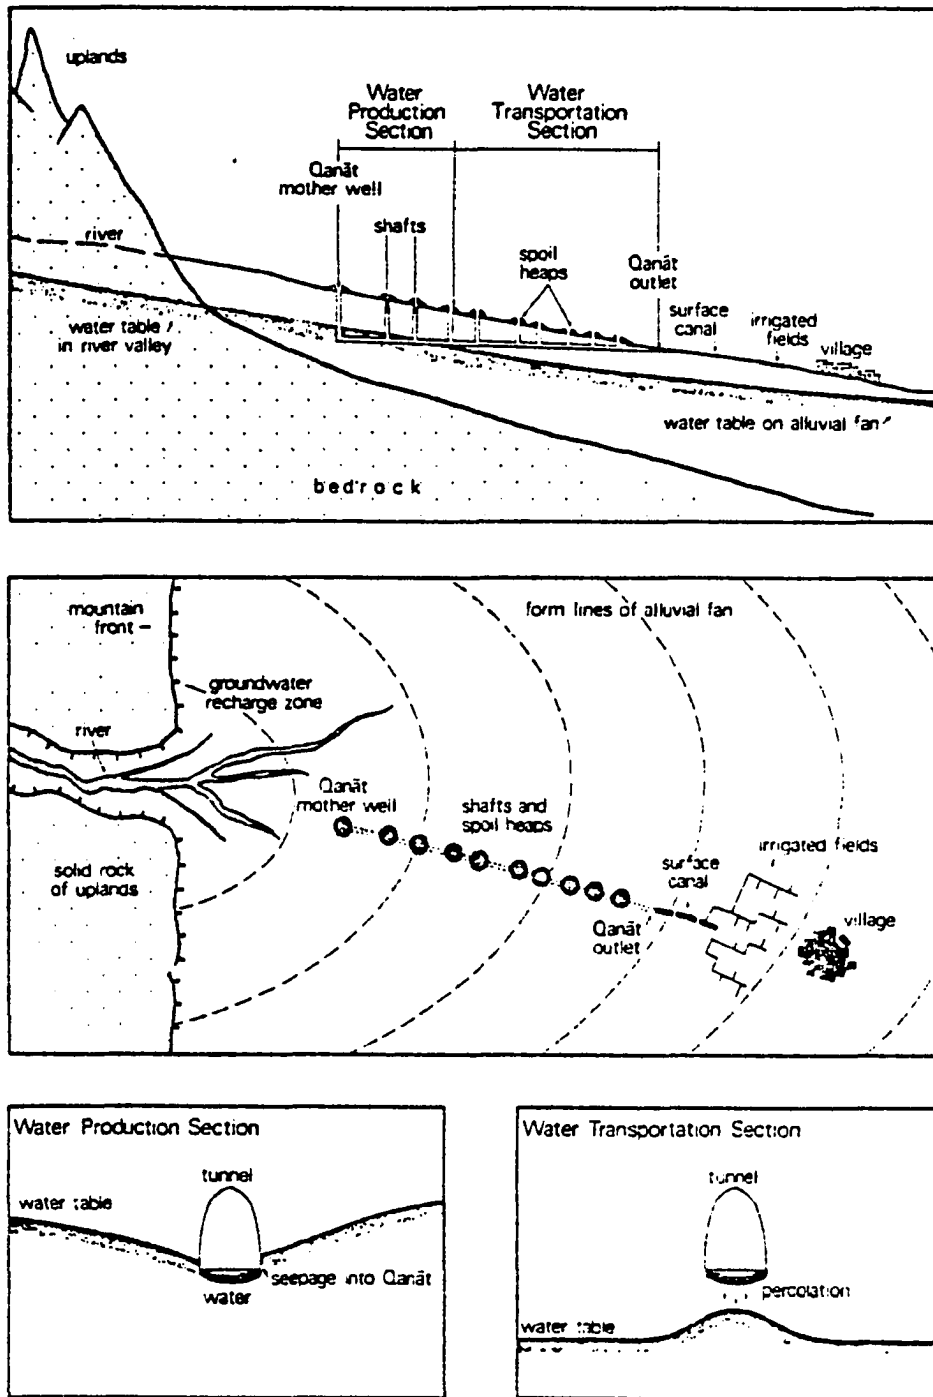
A QANAT: CROSS-SECTION AND PLAN
